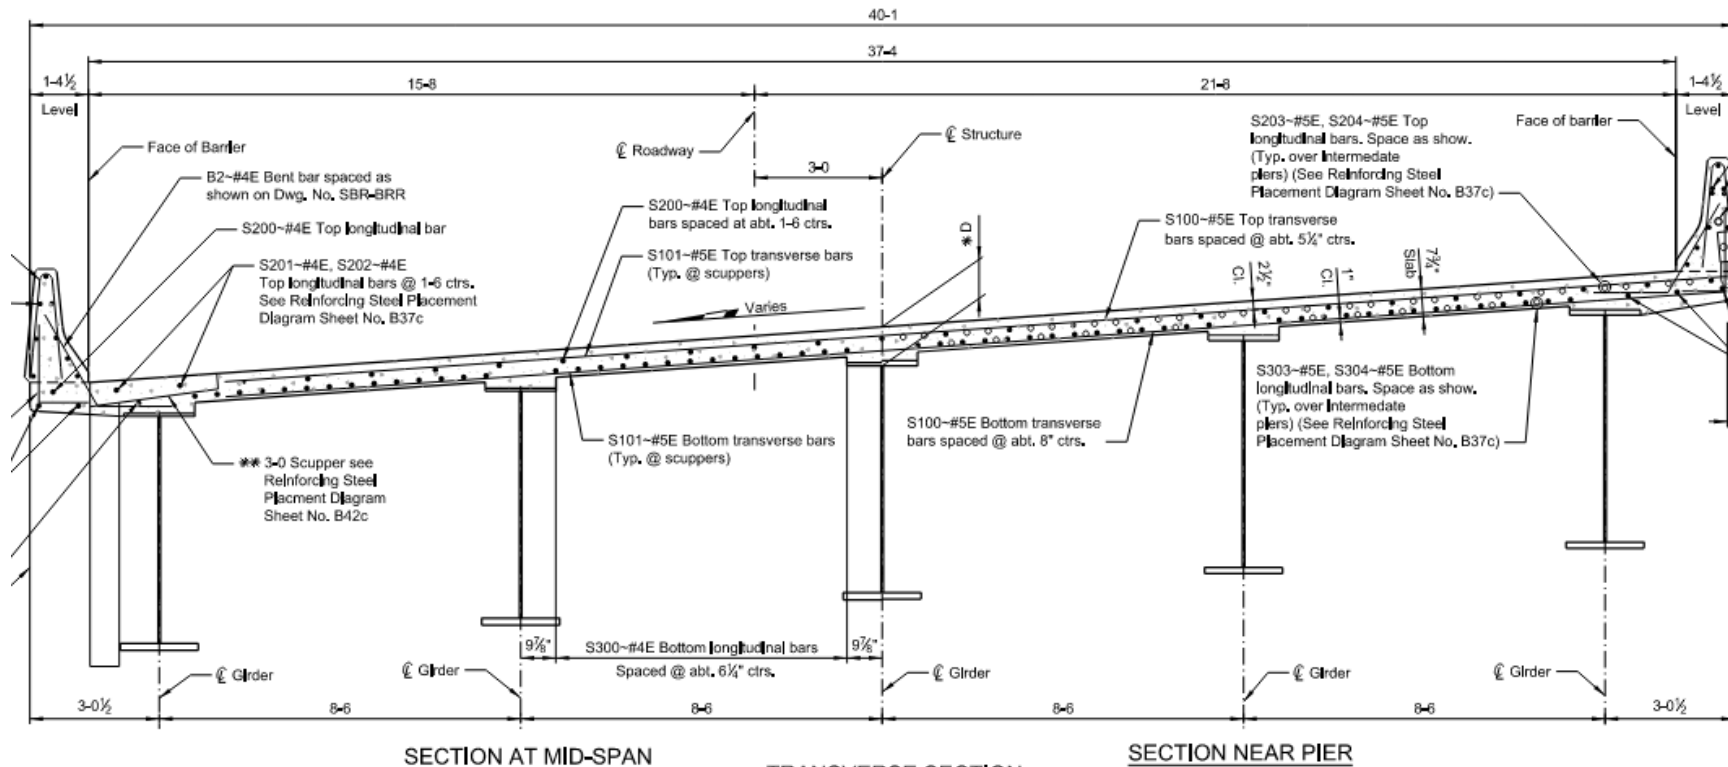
Modeled bridge cross-section, an excerpt from Drawing No. 23386.
